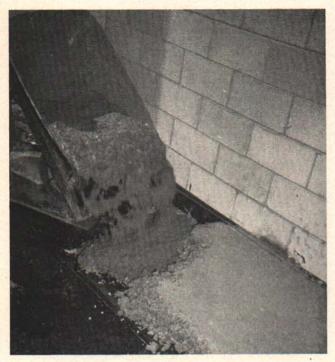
Pouring the finish coat. Concrete should not be poured from a height greater than 4 feet without a chute.
